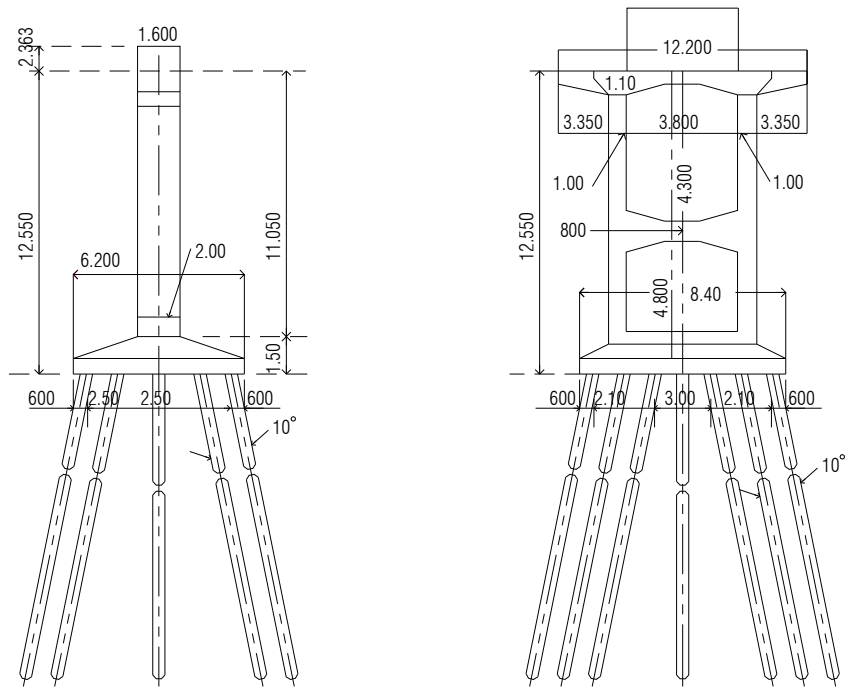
Typical pier-pile assemblage of Yanagizawa viaduct
